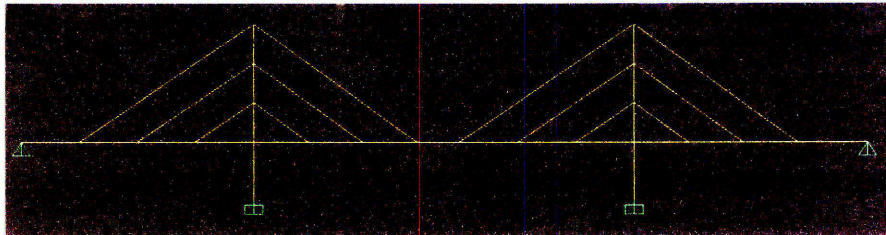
Harp cable arrangement in a cable-stayed bridge
